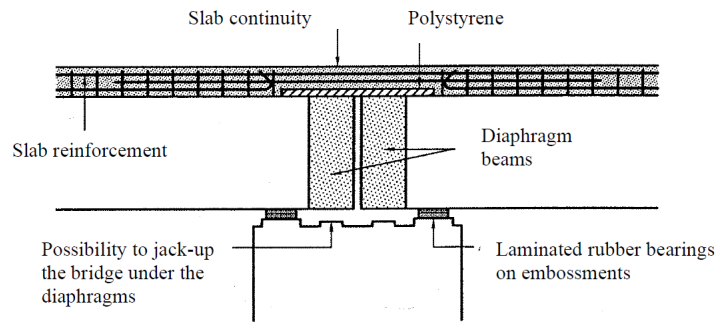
Detail of a simply supported bridge with continuous, separate, slabs (partial continuity; method 1) [68]
